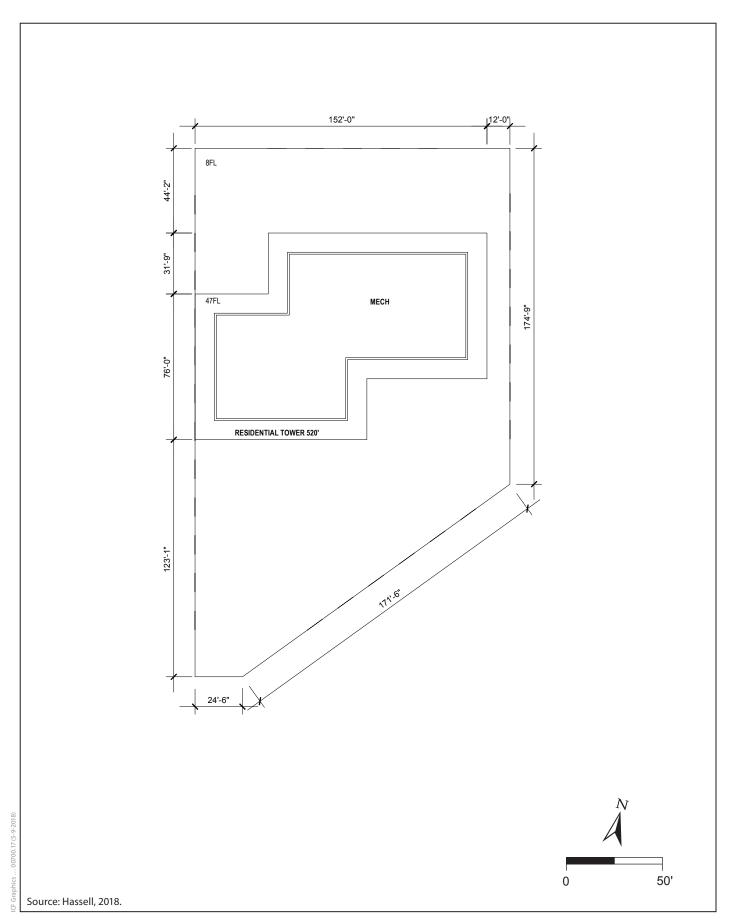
30 Van Ness Avenue Project – Proposed Level 9 Plan
